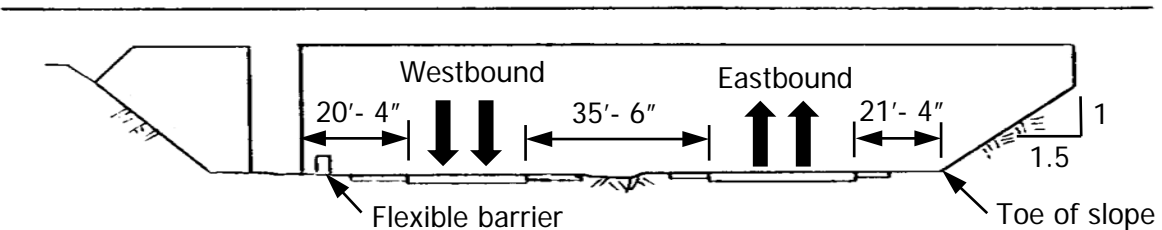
Bridge elevation view of horizontal clearances for separate westbound and eastbound highway features below the bridge, with flexible barrier.
